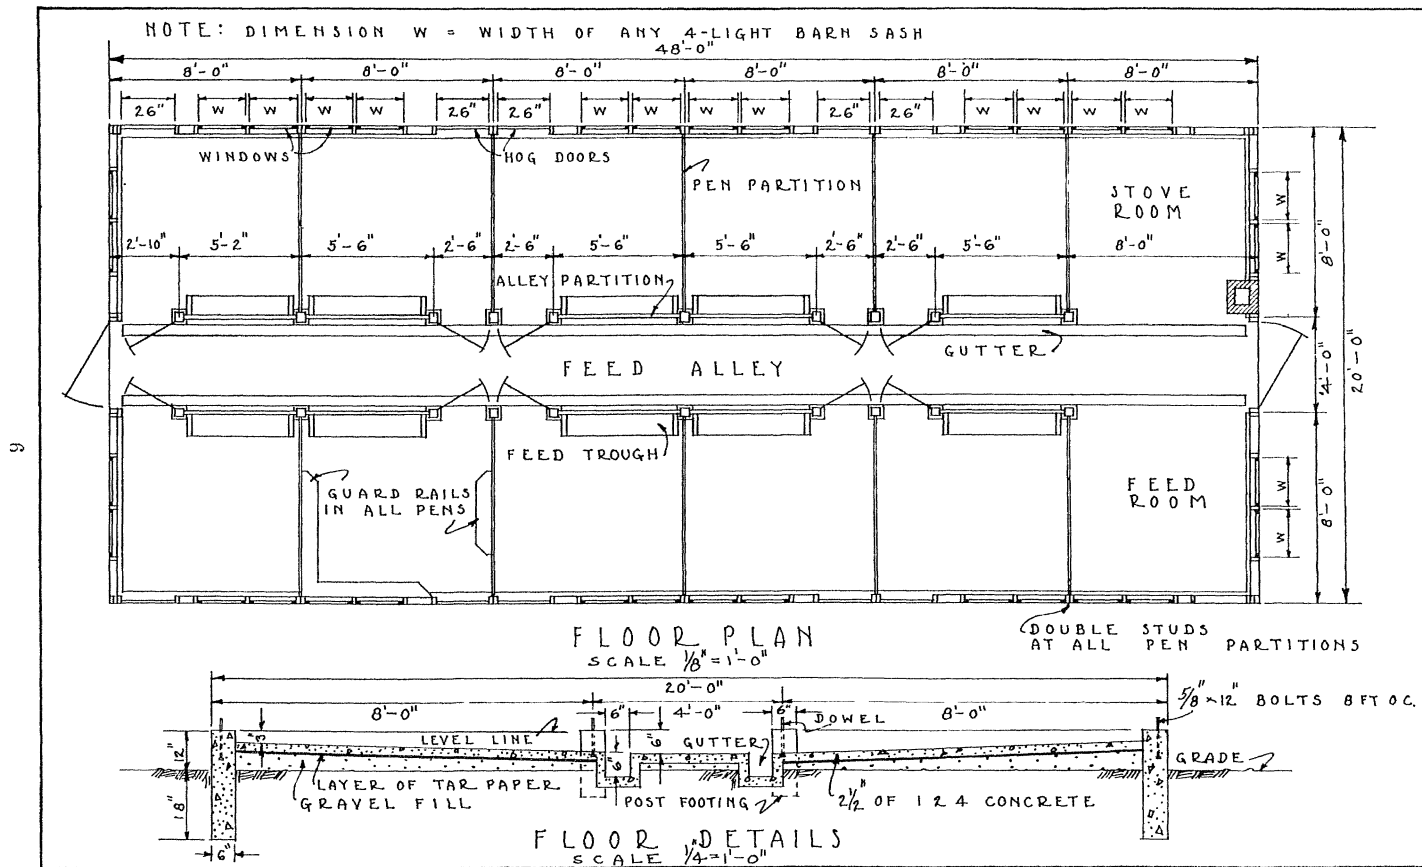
Floor plan for houses shown in Figs. 1 and 3.
